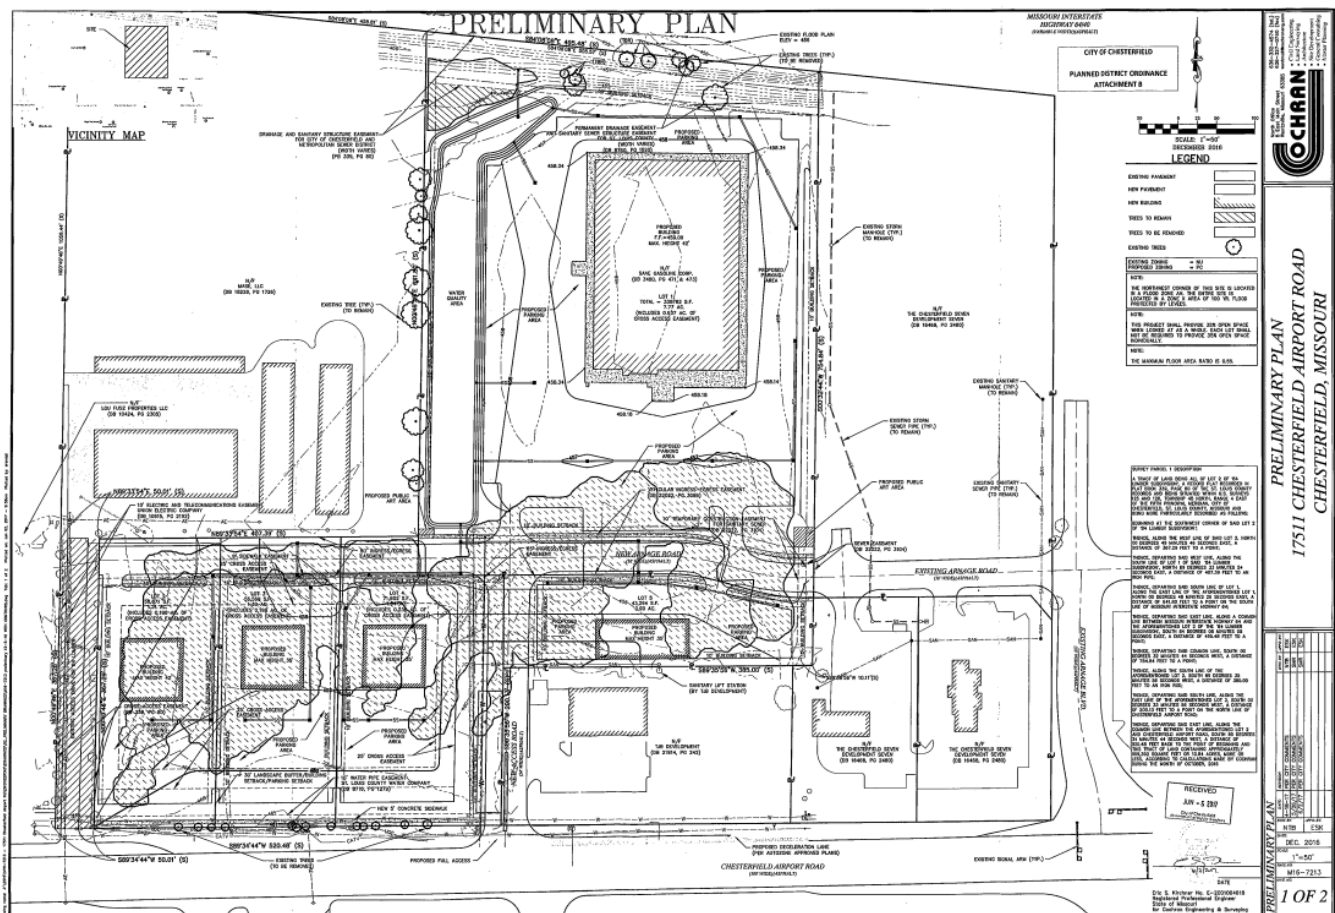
Existing Preliminary Development Plan for Subject Site (Ordinance 2969)
